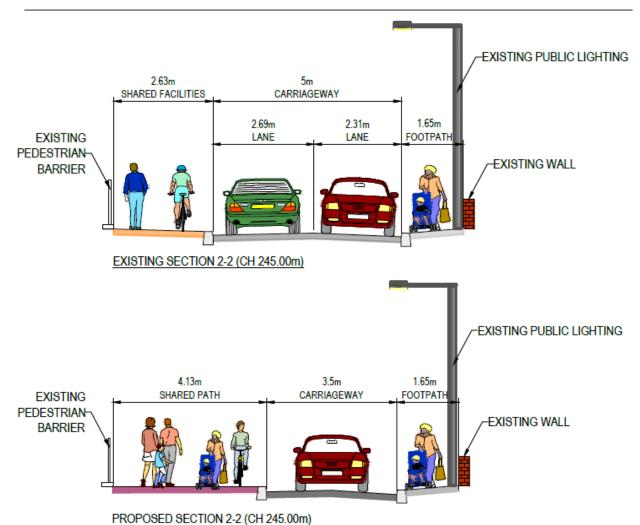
Proposed and existing road cross section No. 2 on Dodder Road Lower.
